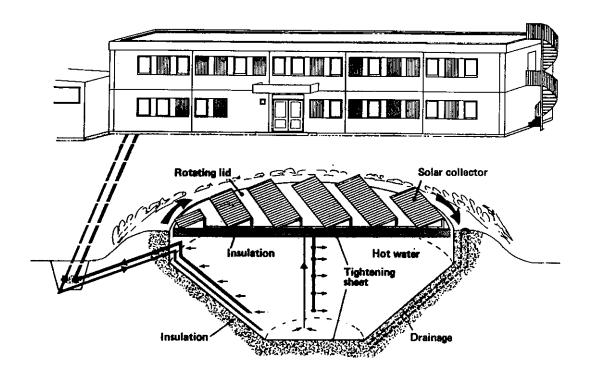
Studsvik pit/Sketch of the pilot plant and office building
